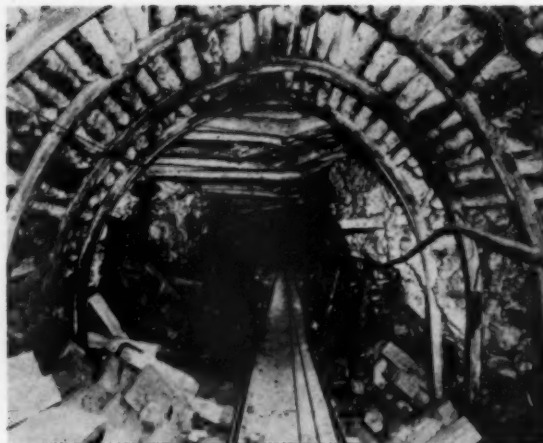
A roadway where bolts have not been used, 800 ft from the working face.
